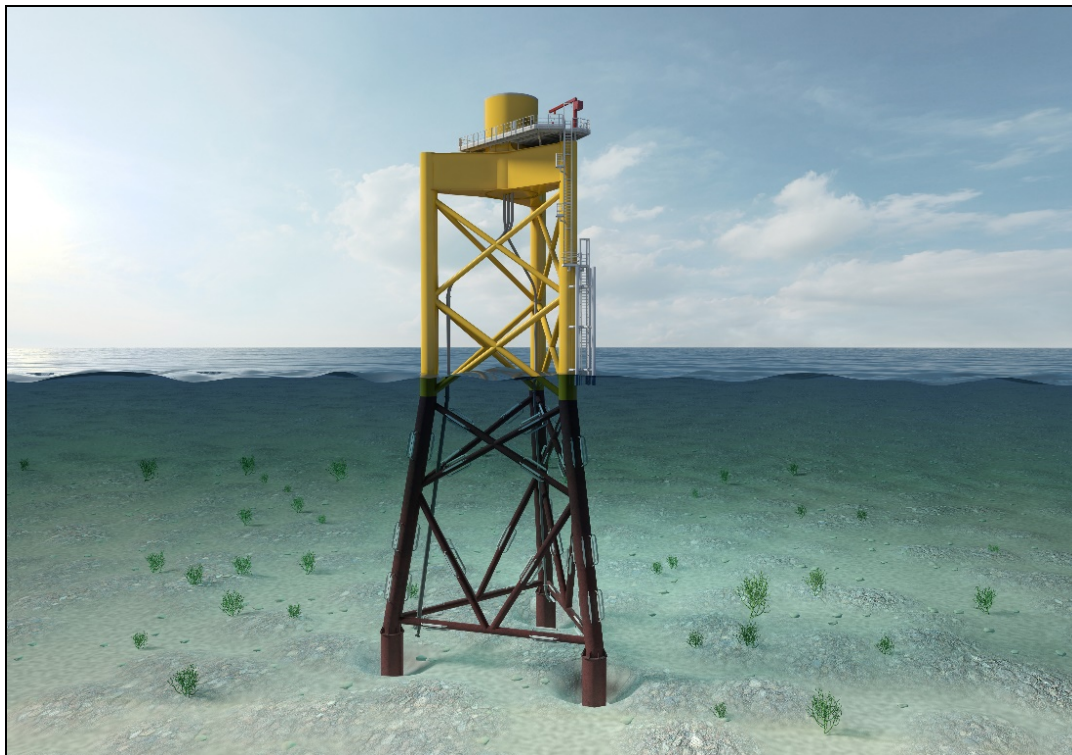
Piled jacket conceptual drawing (pre-installed vertical piles).
